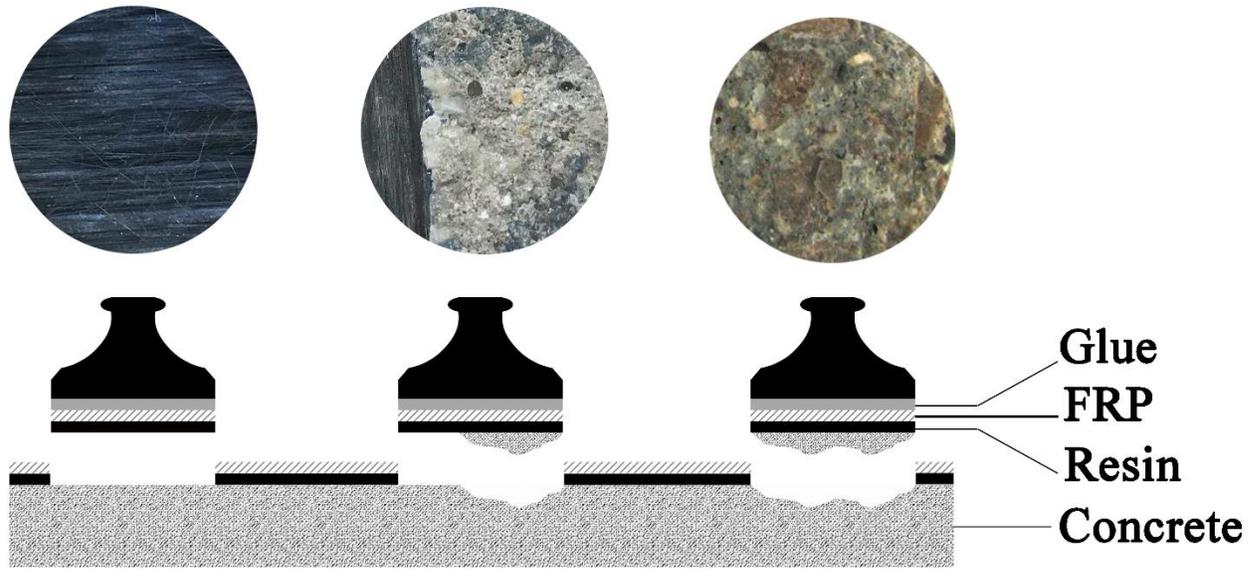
Pull-off Test Failure Modes: (a) FRP adhesive failure; (b) Mixed concrete/FRP failure; (c) Concrete substrate failure
